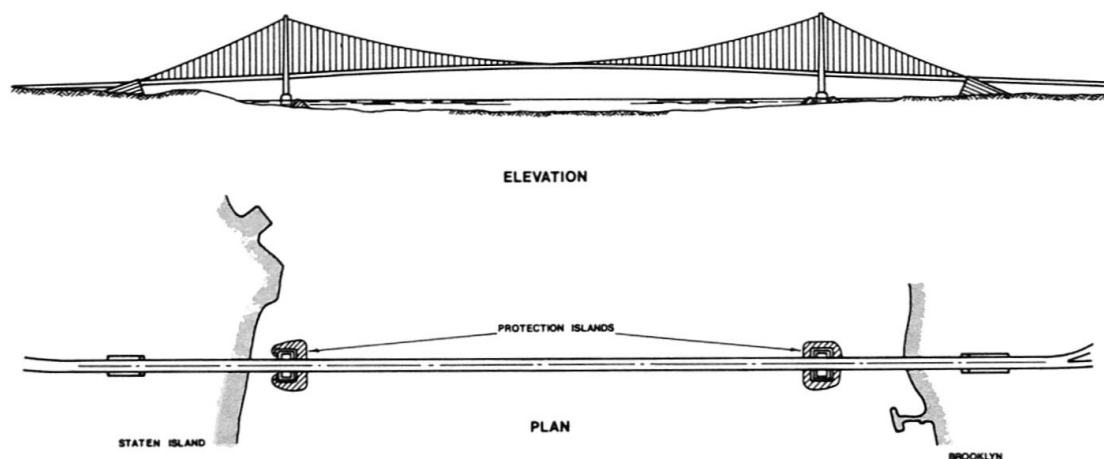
Verrazano-Narrows Bridge. The piers are protected by means of artificial islands. The figure is based on material from Triborough Bridge and Tunnel District (111).
